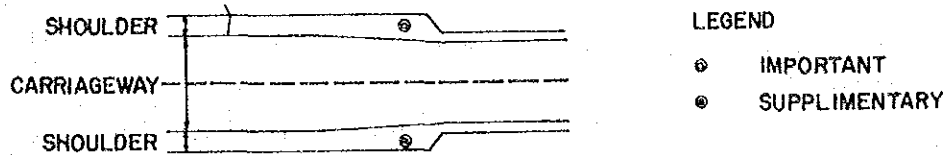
Typical Luminaire Arrangement (Width Transition)
